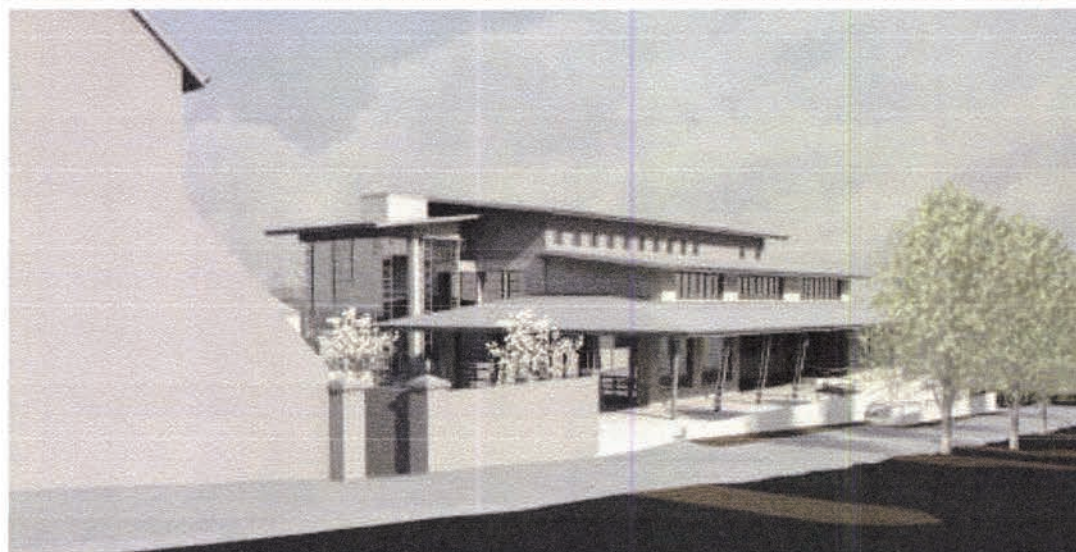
View of development from Hill Street looking southwest. (Source Stephen Rose Architects - Sheet A.14)
